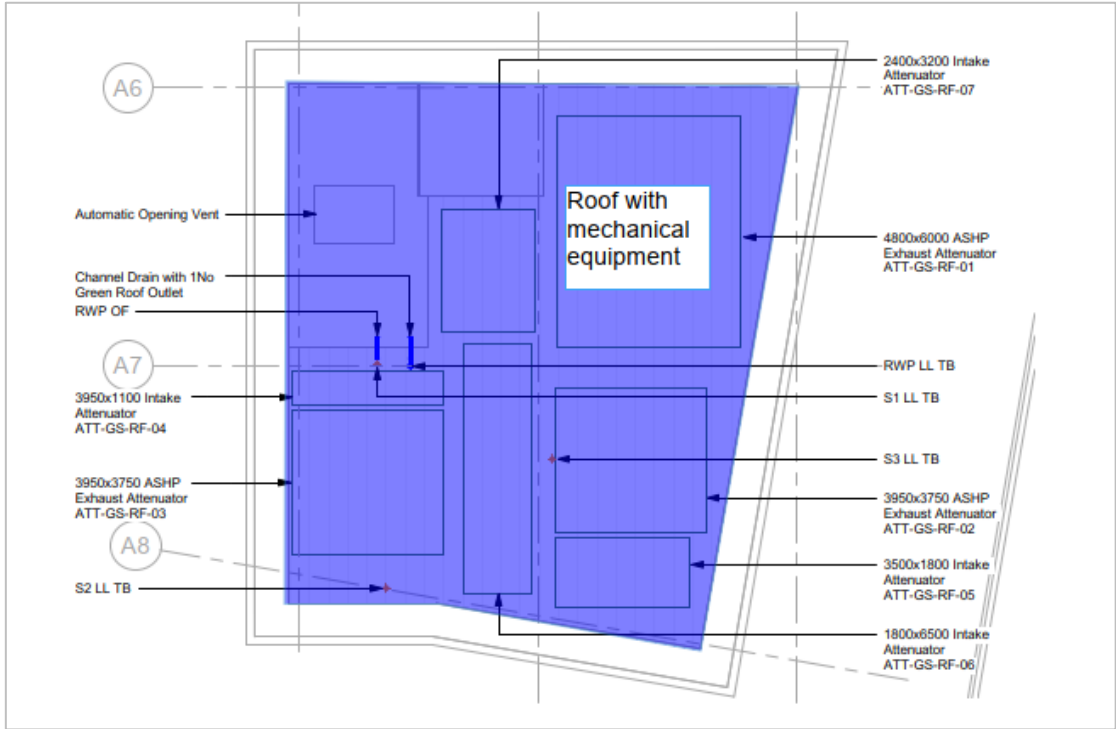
Vine Lane roof, allocated to both mechanical equipment and terrace, overshadowed by 1 Museum Street
